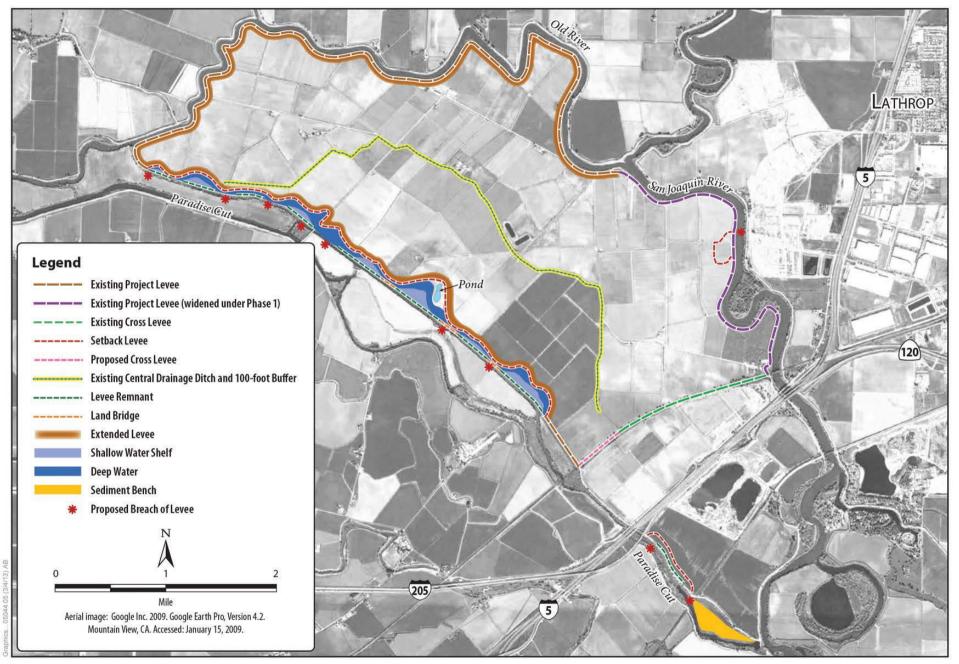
Alternative 3—Avoidance of Central Drainage Ditch
